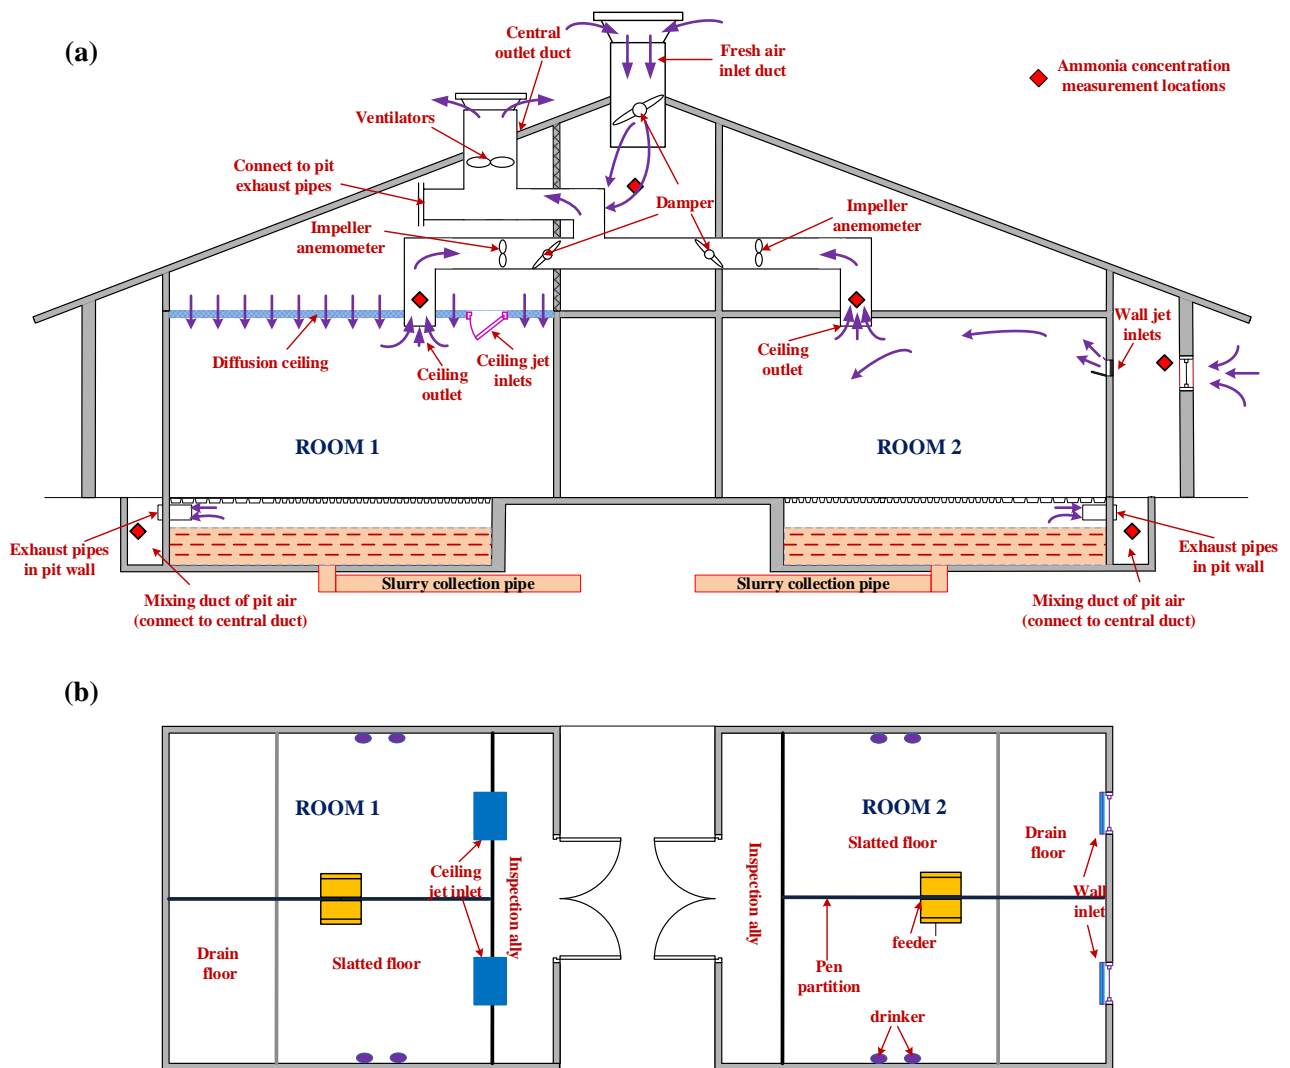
(a) cross-section of the experimental building; (b) floor plan of the investigated rooms.
